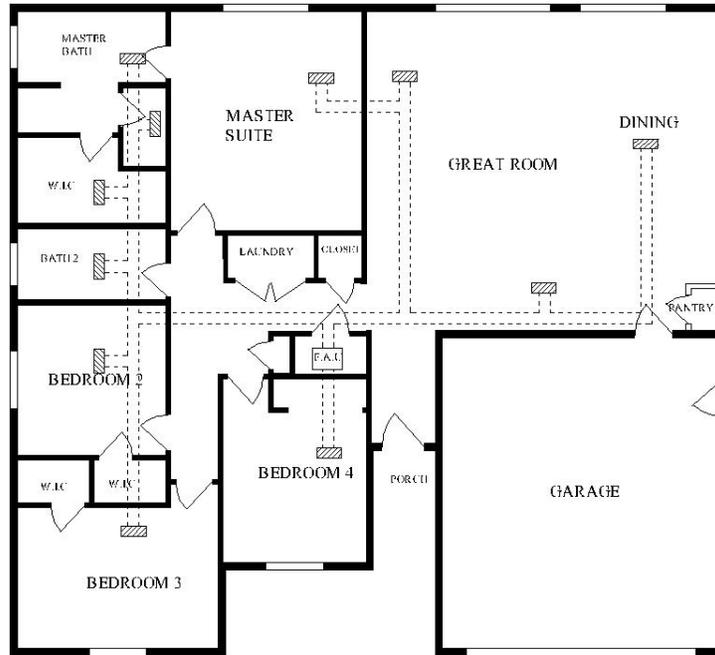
As-built attic duct chases for G.J. Gardner 1,816-ft² plan
